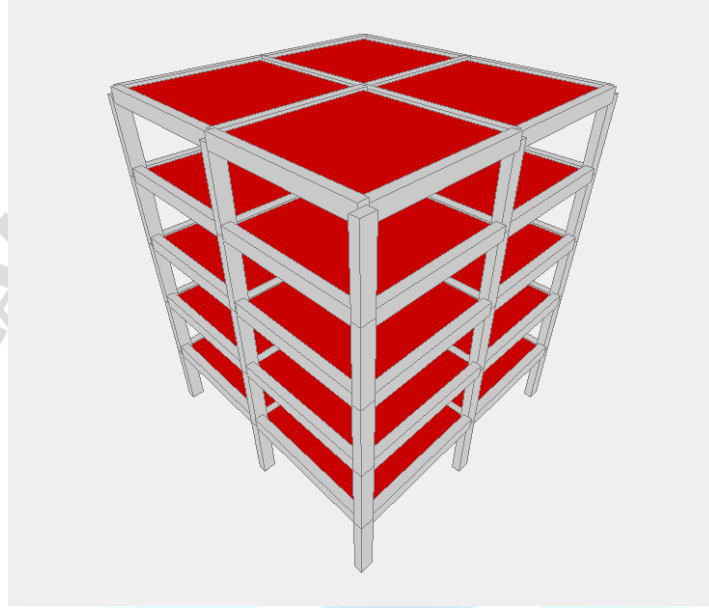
3D Finite Element Model of Reinforced Concrete Structure
